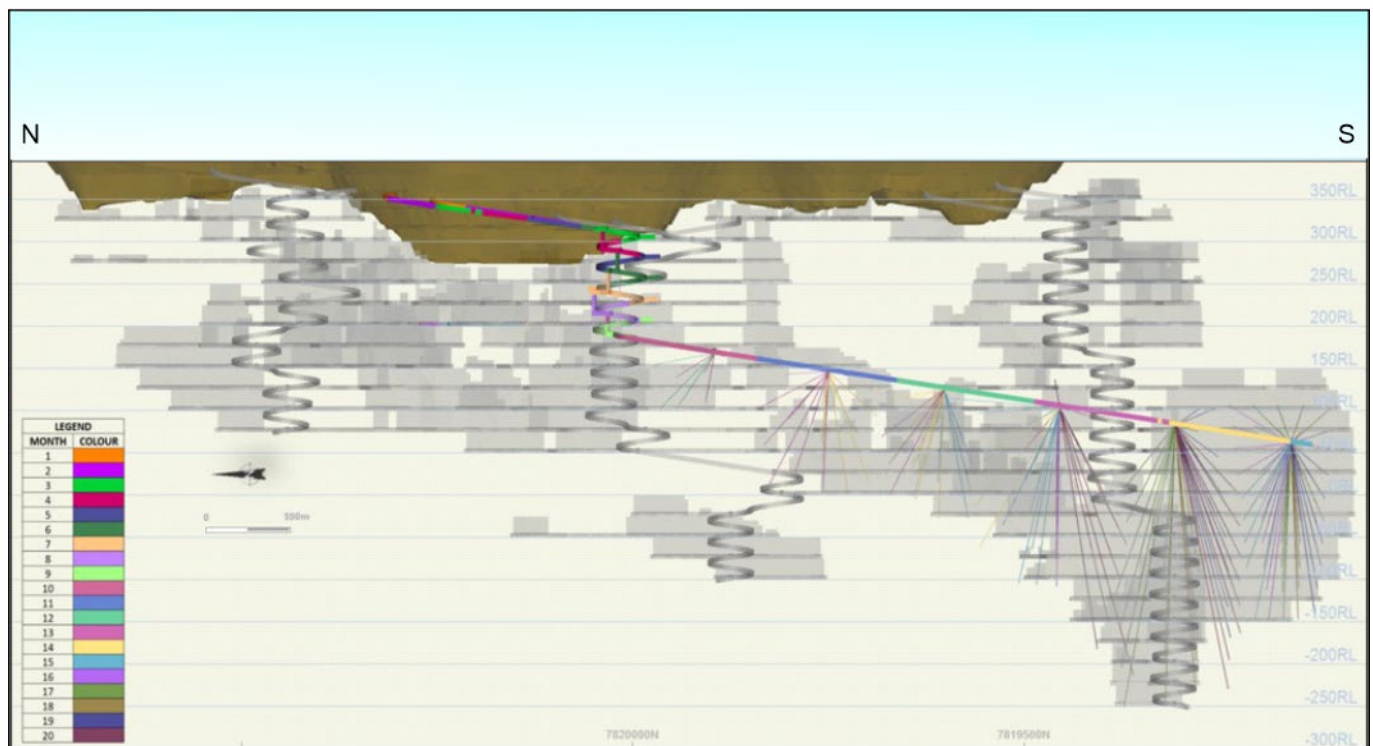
Planned Exploration Decline at Groundrush. View looking east.
